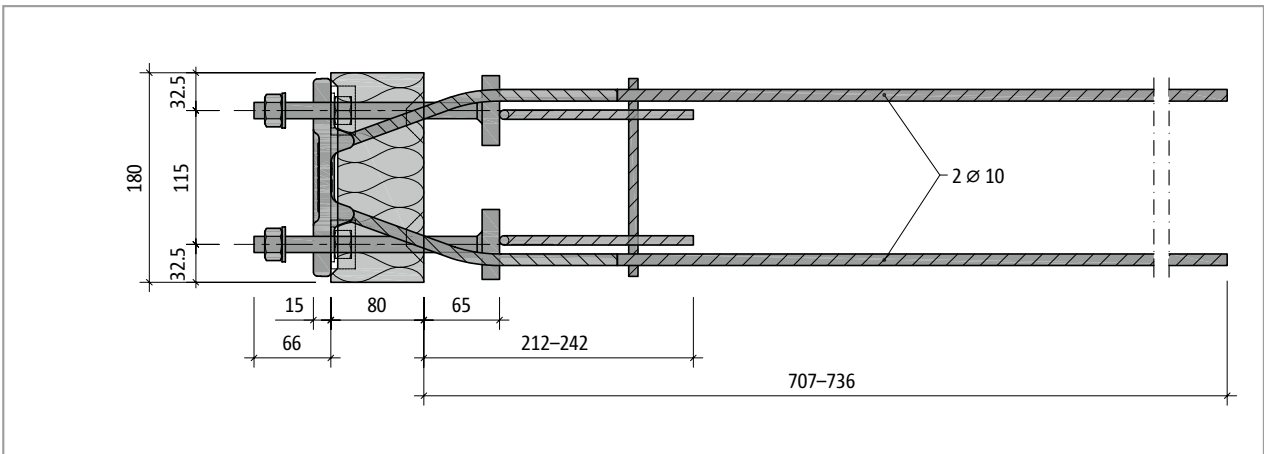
Schöck Isokorb® T type SQ-V2: Plan view
